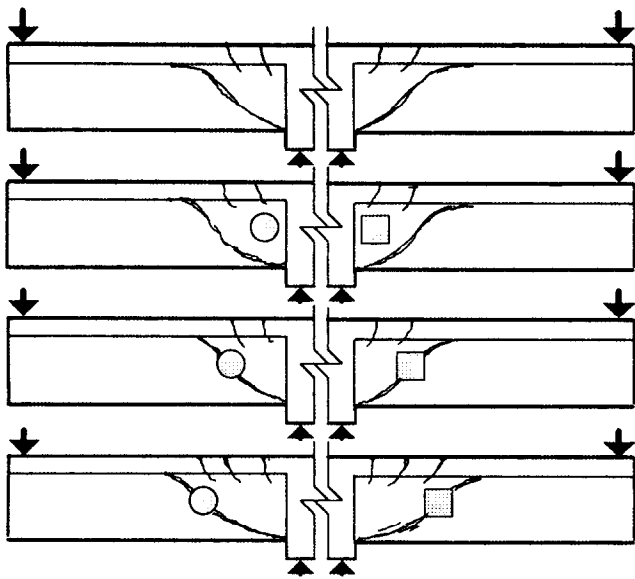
Typical shear failure of a beam with small openings containing no shear reinforcement^{19,3}.
